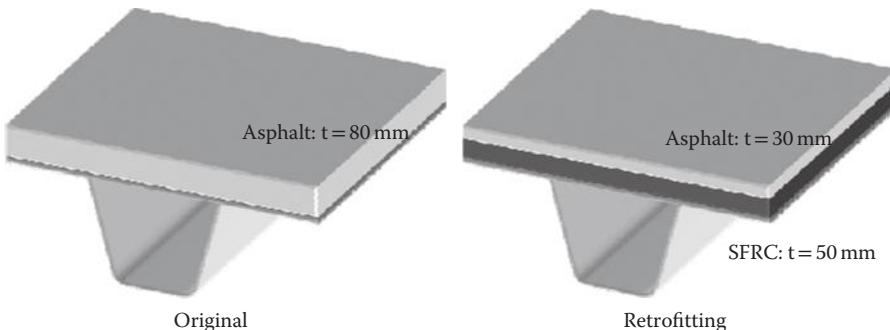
Modification of asphalt pavements to steel fiber reinforcement concrete pavements in the lower deck of Yokohama Bay Bridge.
